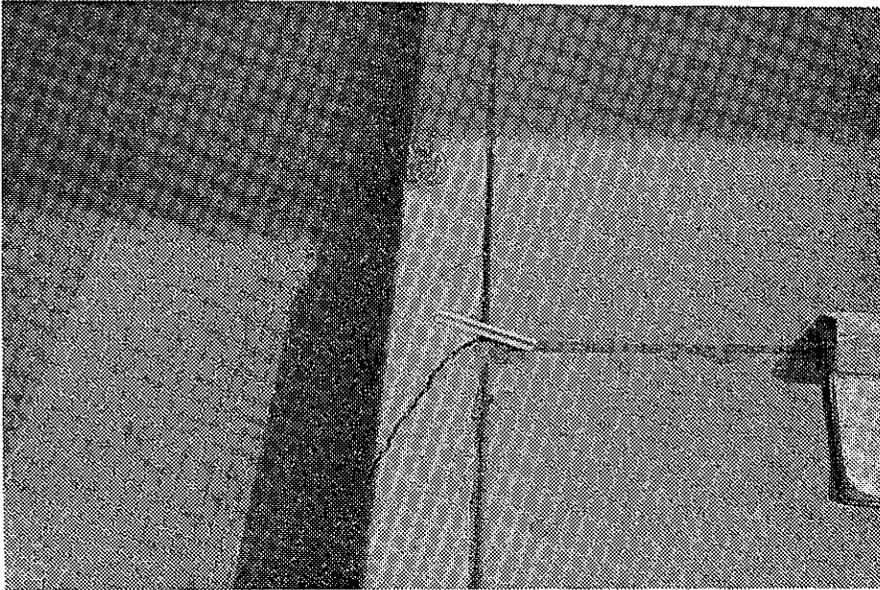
Typical curb crack and displacement caused by forces from curtain wall movement.
